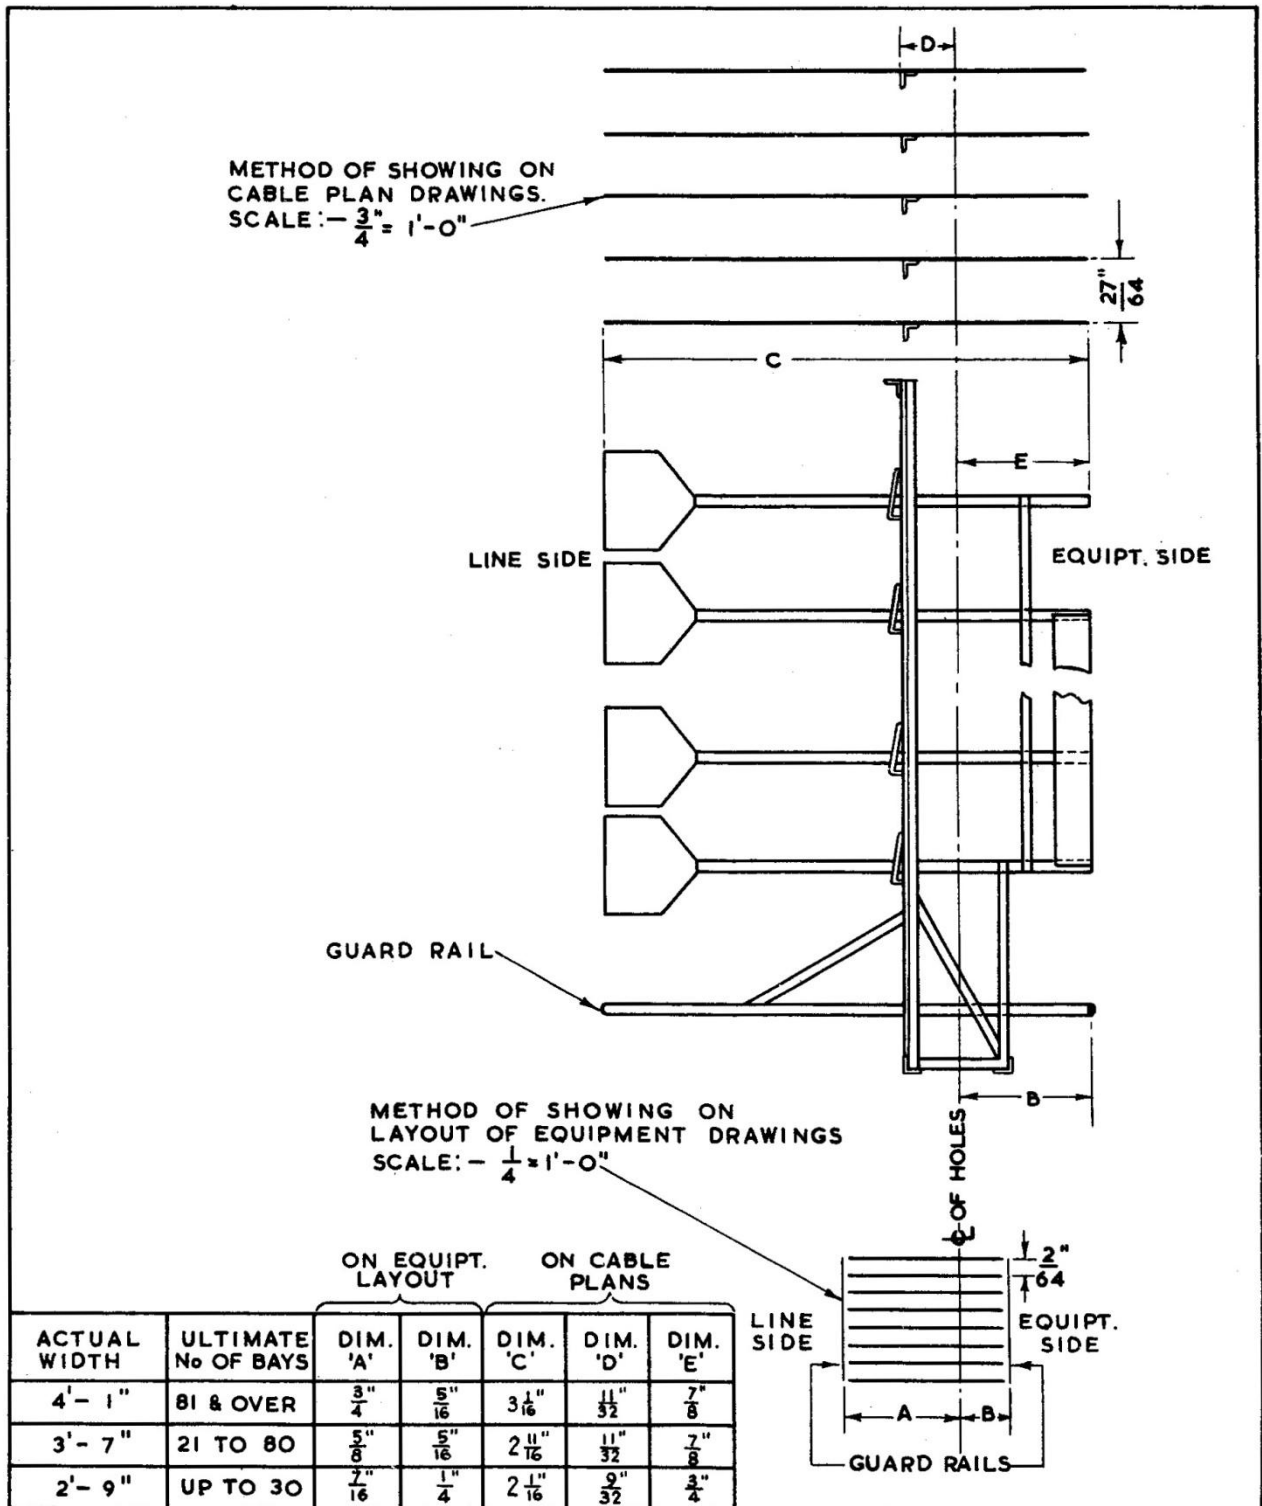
2000 TYPE EQUIPMENT, METHOD OF SHOWING M.D.F. ON LAYOUT OF EQUIPMENT AND CABLE PLAN DRAWINGS.
